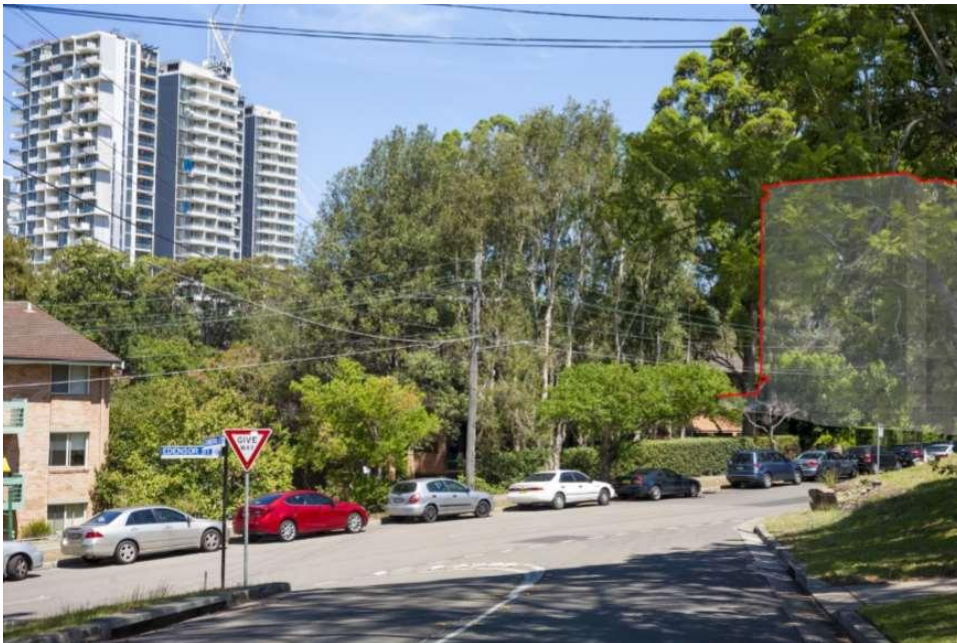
Canberra Street near the intersection of Edensor Street looking south (indicative) (Source: Architectural Images)
